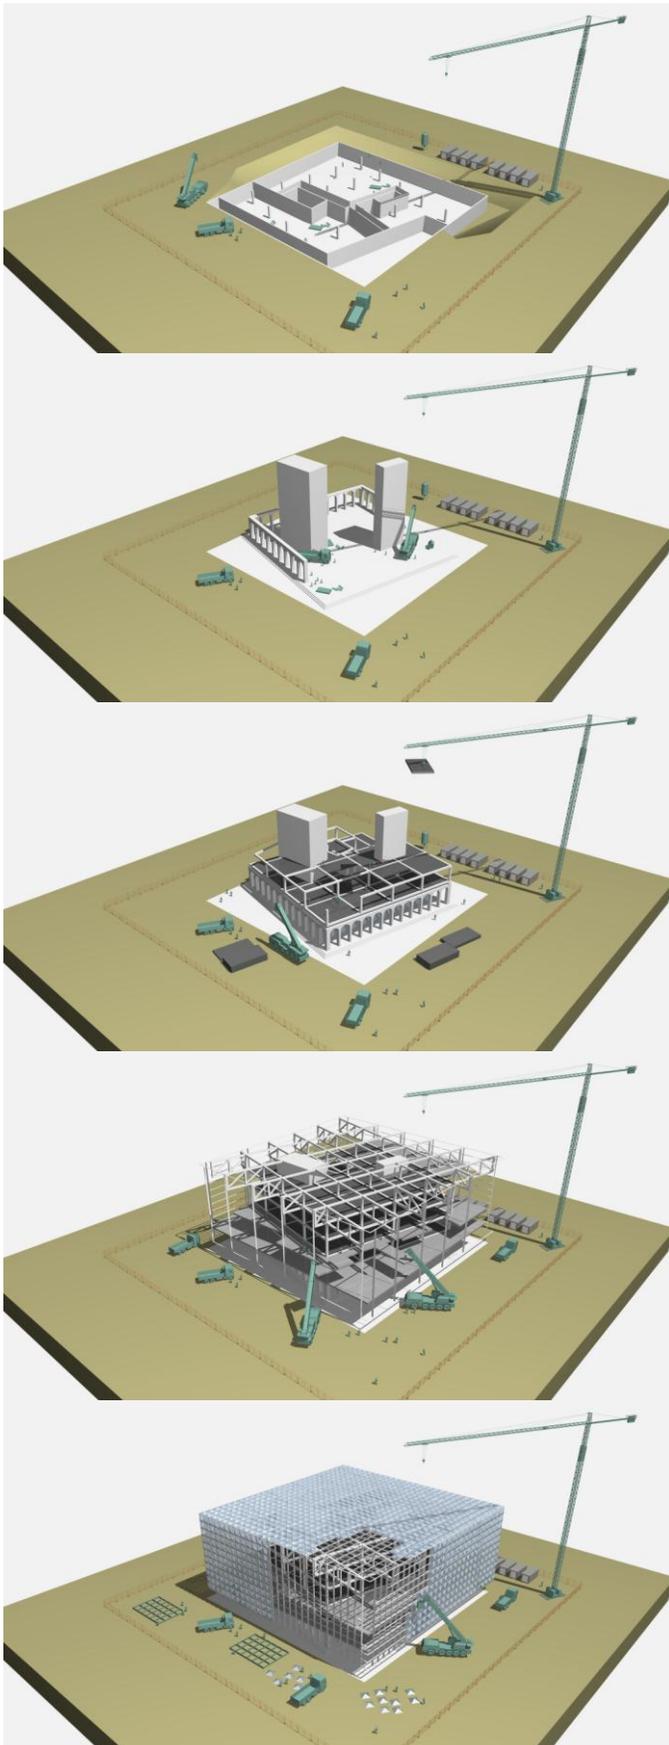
(a, b, c, d, e) Building site, foundations and basements, structures of stiff units, prefabricate ground structures, covering steel structure, closeout structure
